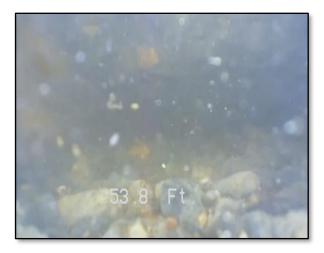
STA 00+53: Rocks on the bottom of the pipe.
